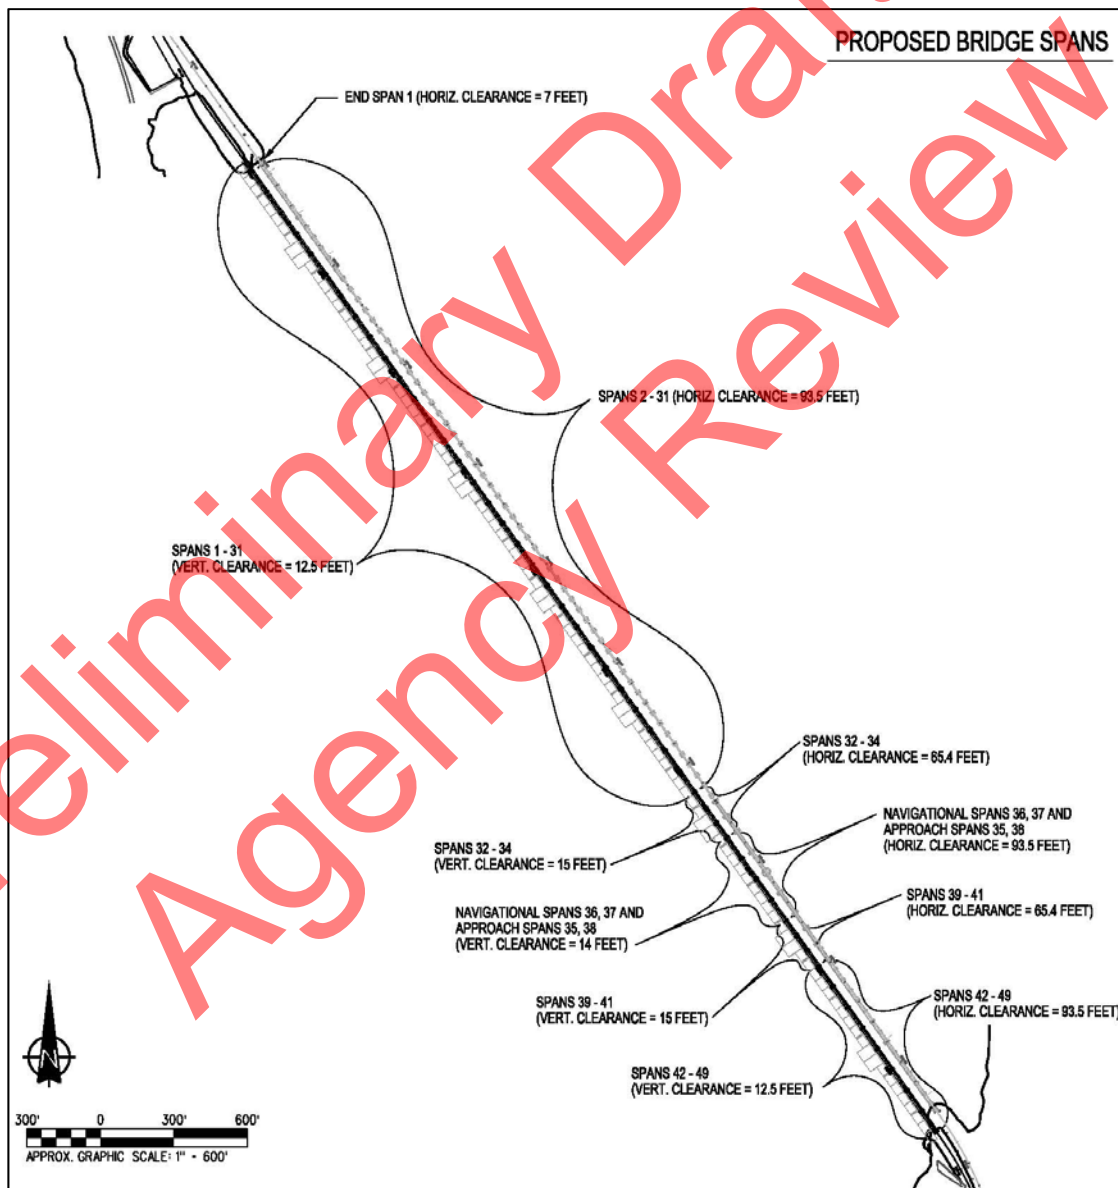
Bridge 3.9 New Bridge Spans (Permanent)
